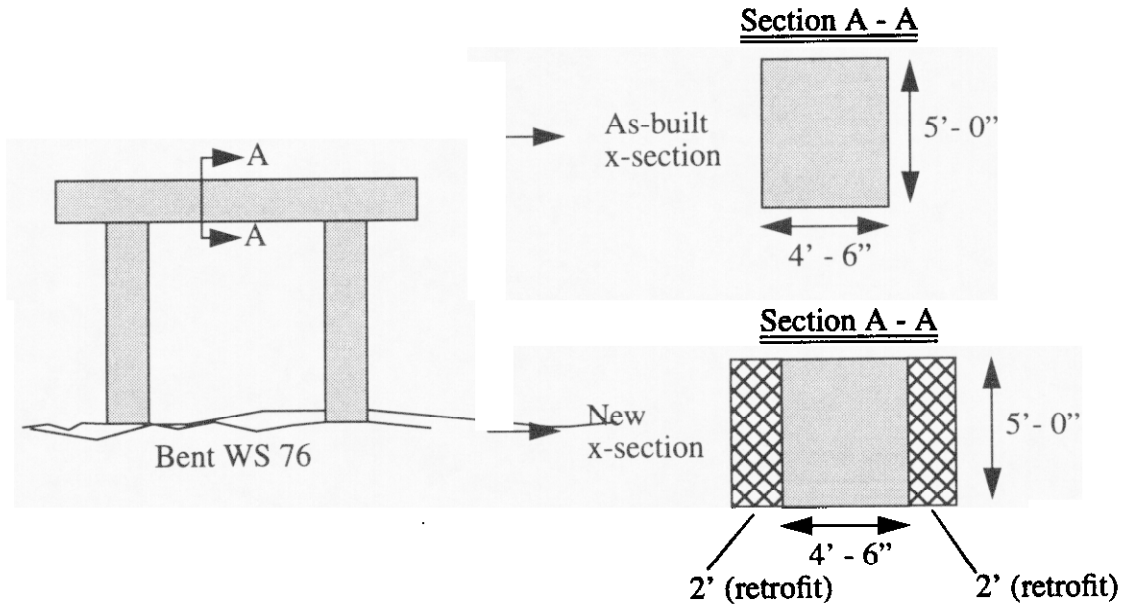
Retrofit of bent cap beams with the addition of bolsters
